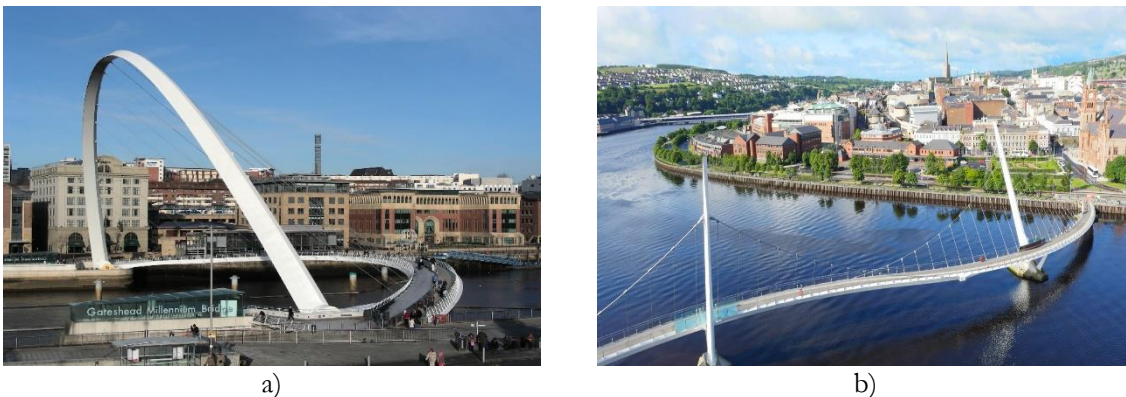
Bridges curved in plan: a) Gateshead Millennium Bridge (Newcastle, 2001) [3]; and b) Peace Bridge (Londonderry, Northern Ireland, 2011) [4]
